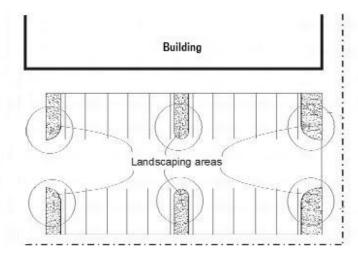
Parking Lot Landscape Areas with Two Rows Of Parking
